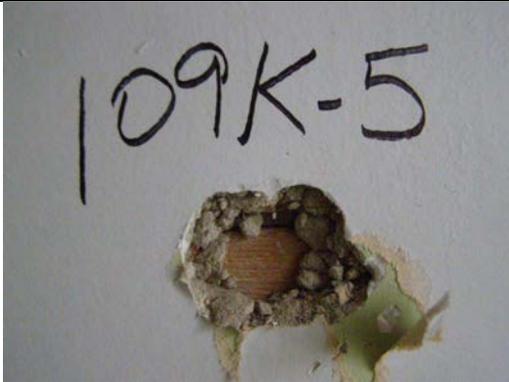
Plaster (109K-5) Bedroom, Wall A.
